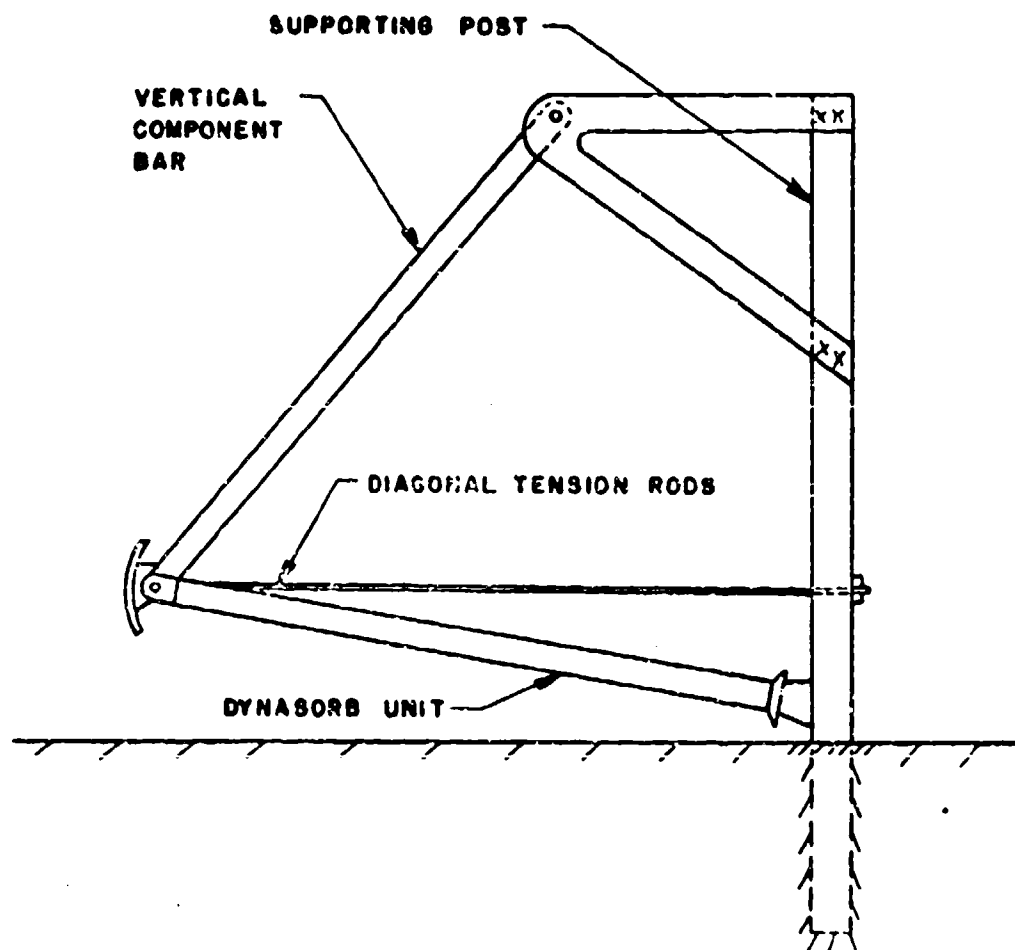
HIGHWAY GUARD RAIL INSTALLATION
